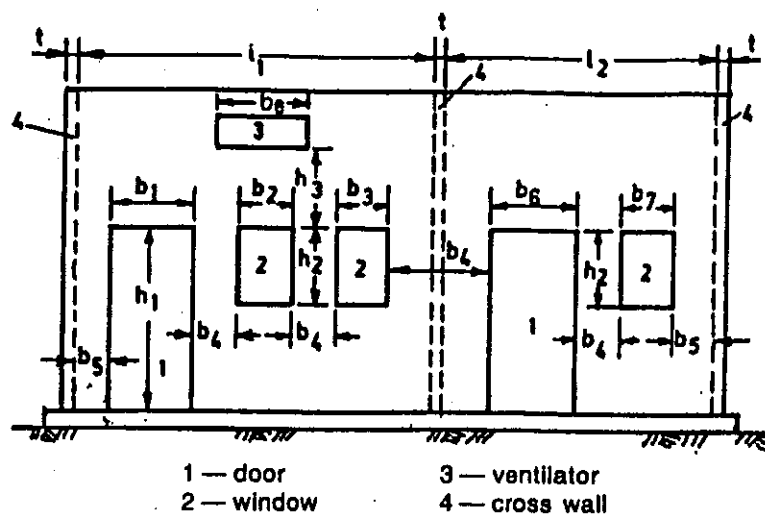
DIMENSIONS OF OPENINGS AND PIERS FOR RECOMMENDATIONS IN TABLE 4
